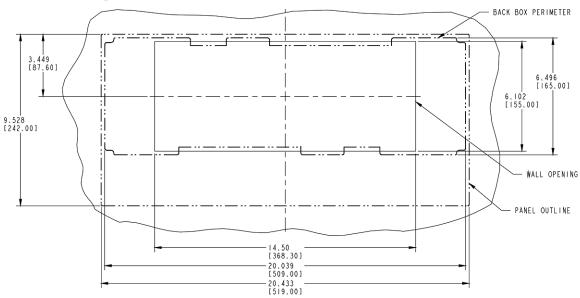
MXD-2001-PAN-L Installation Dimensions (front view)
